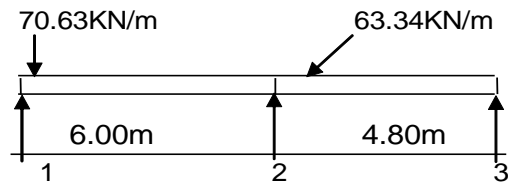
Typical loading pattern on a beam supporting two-way spanning slab.
